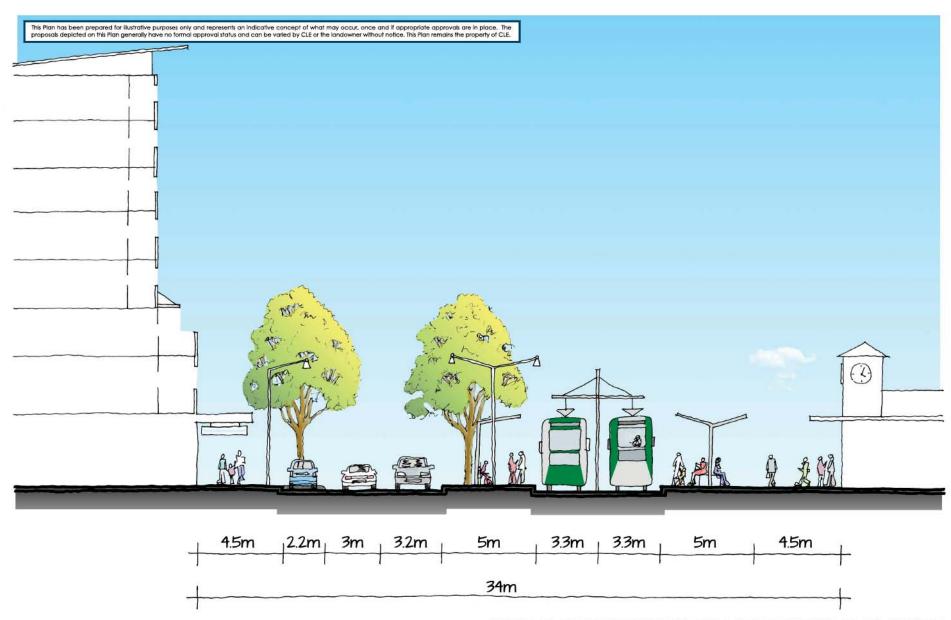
TRANSIT STREET ABUTTING RAILWAY STATION CROSS SECTION
